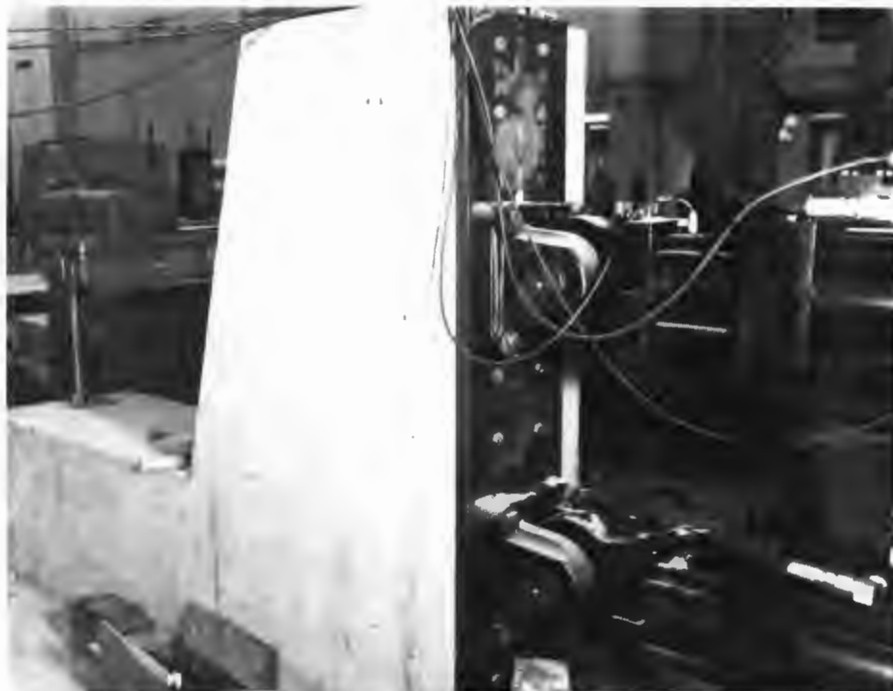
DETAIL OF RAMS-ABUTMENT CONNECTION
